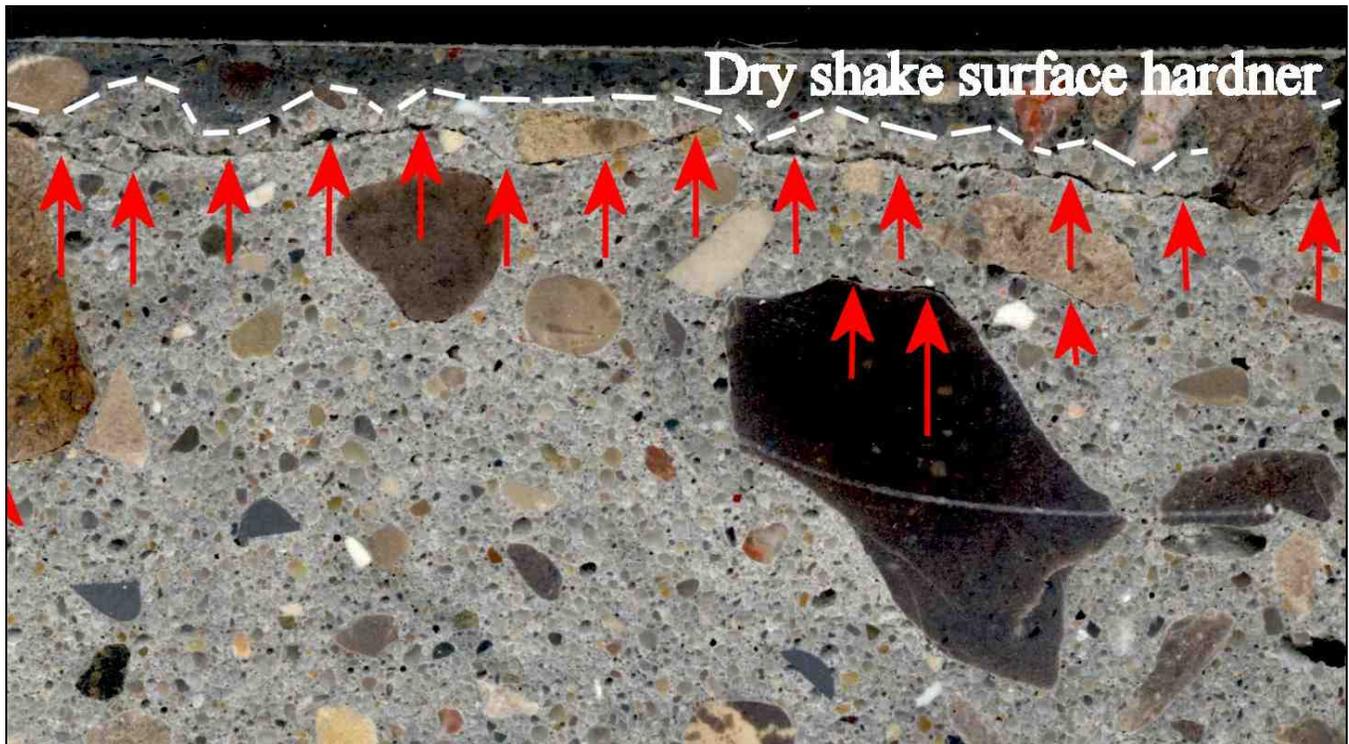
Cross section of a concrete core from a delaminated machine-trowel-finished industrial concrete floor, which has received a “dry shake” mineral surface hardener. The plane of delamination (marked by red arrows) is situated beneath the dense, dark gray surface region [the top $\frac{1}{8}$ in. (3 mm)] where the hardeners are present. Prolonged finishing operations (beyond what was needed to incorporate and embed the hardeners into the concrete), probably to achieve the anticipated floor flatness, has caused an eventual development of a plane of separation between the near-surface trowel-affected zone (i.e., the portion above the plane of delamination) and the interior concrete not affected by finishing.
